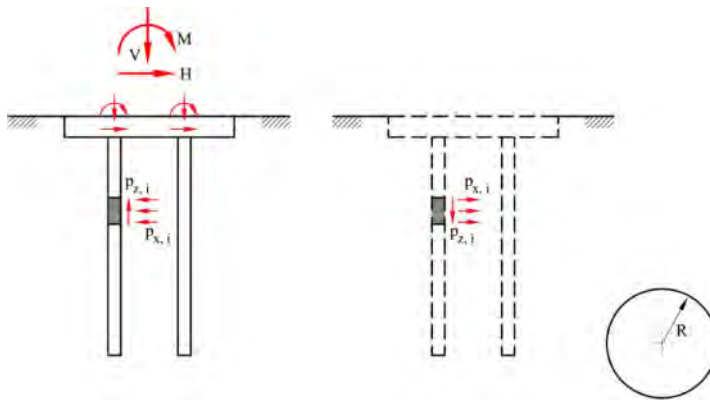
The analysis of a pile foundation in presence of a tunnel construction. Left: the capped pile structure. Right: Soil half space and tunnel.
